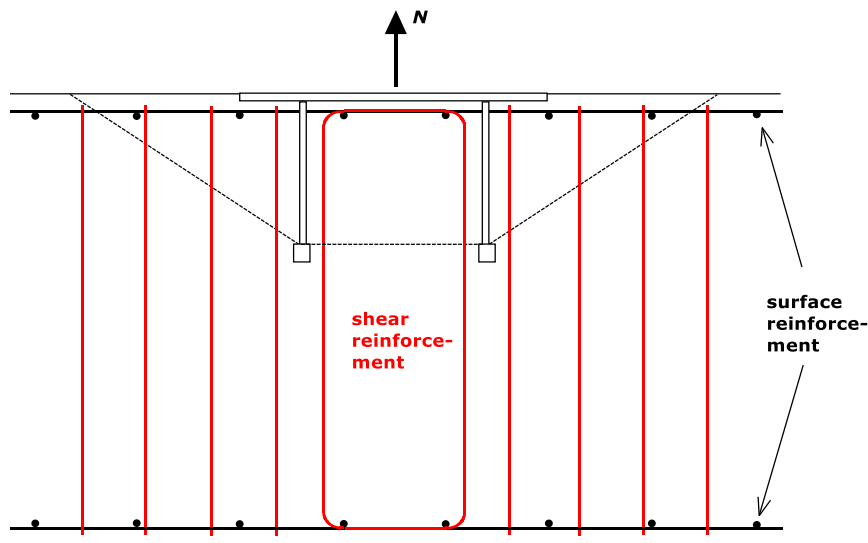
Concrete structure with shear reinforcement (in red) in the vicinity of the anchor plate.
